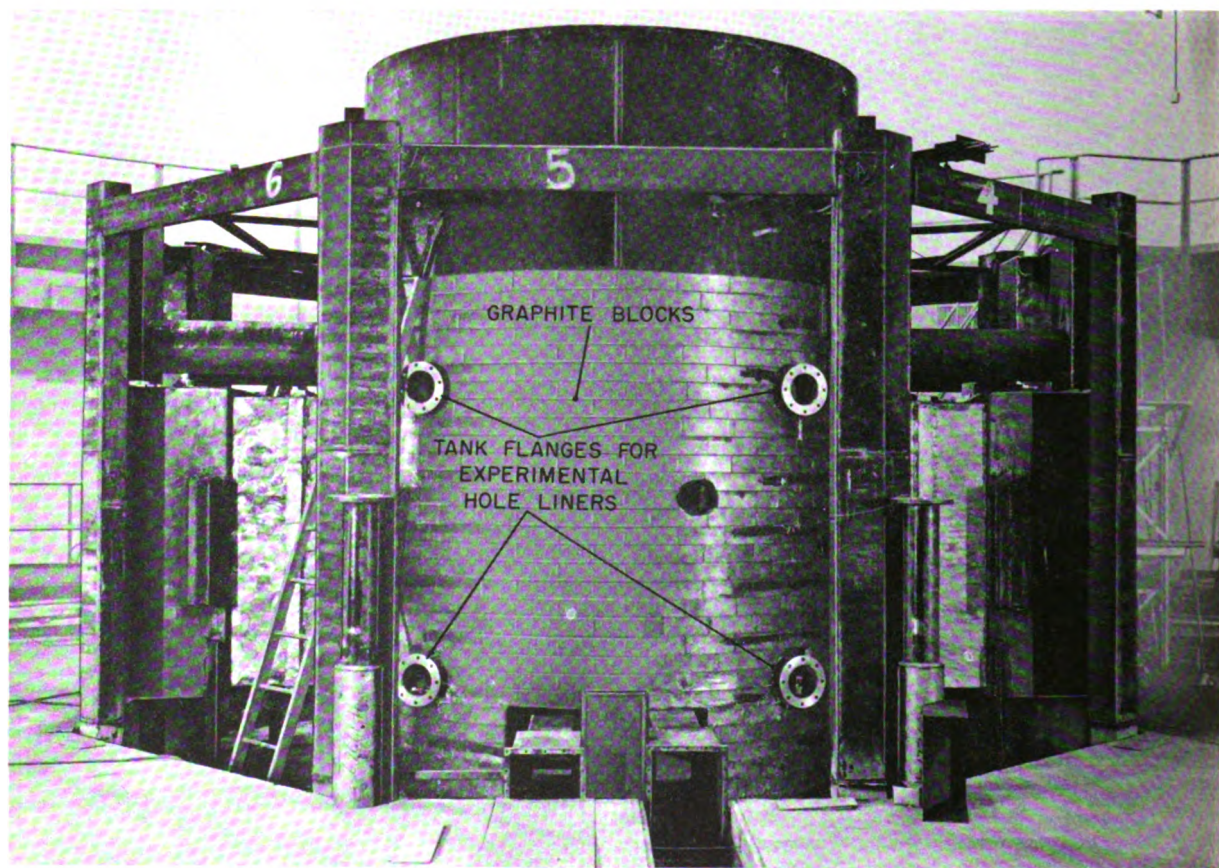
Steel-tank flanges placed for experimental-hole liners.
